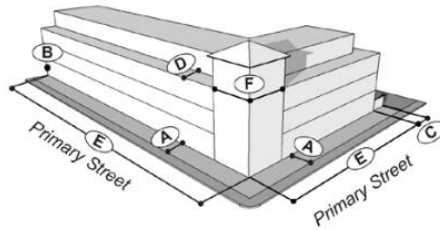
D-412 Building Placement and Configuration and Street Types
